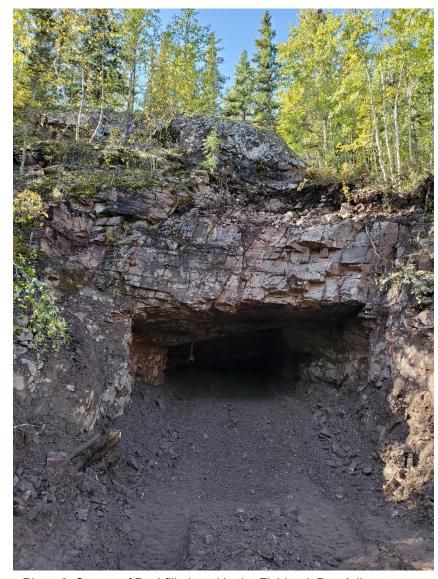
Stages of Backfill placed in the Fishhook Bay Adit
